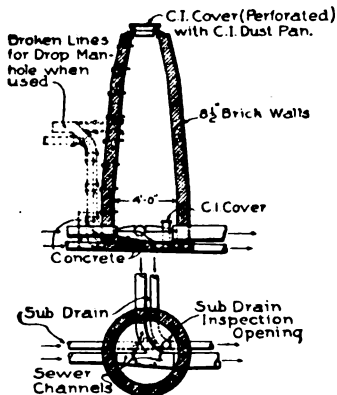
Sectional Elevation and Plan of Sewer Manhole.
